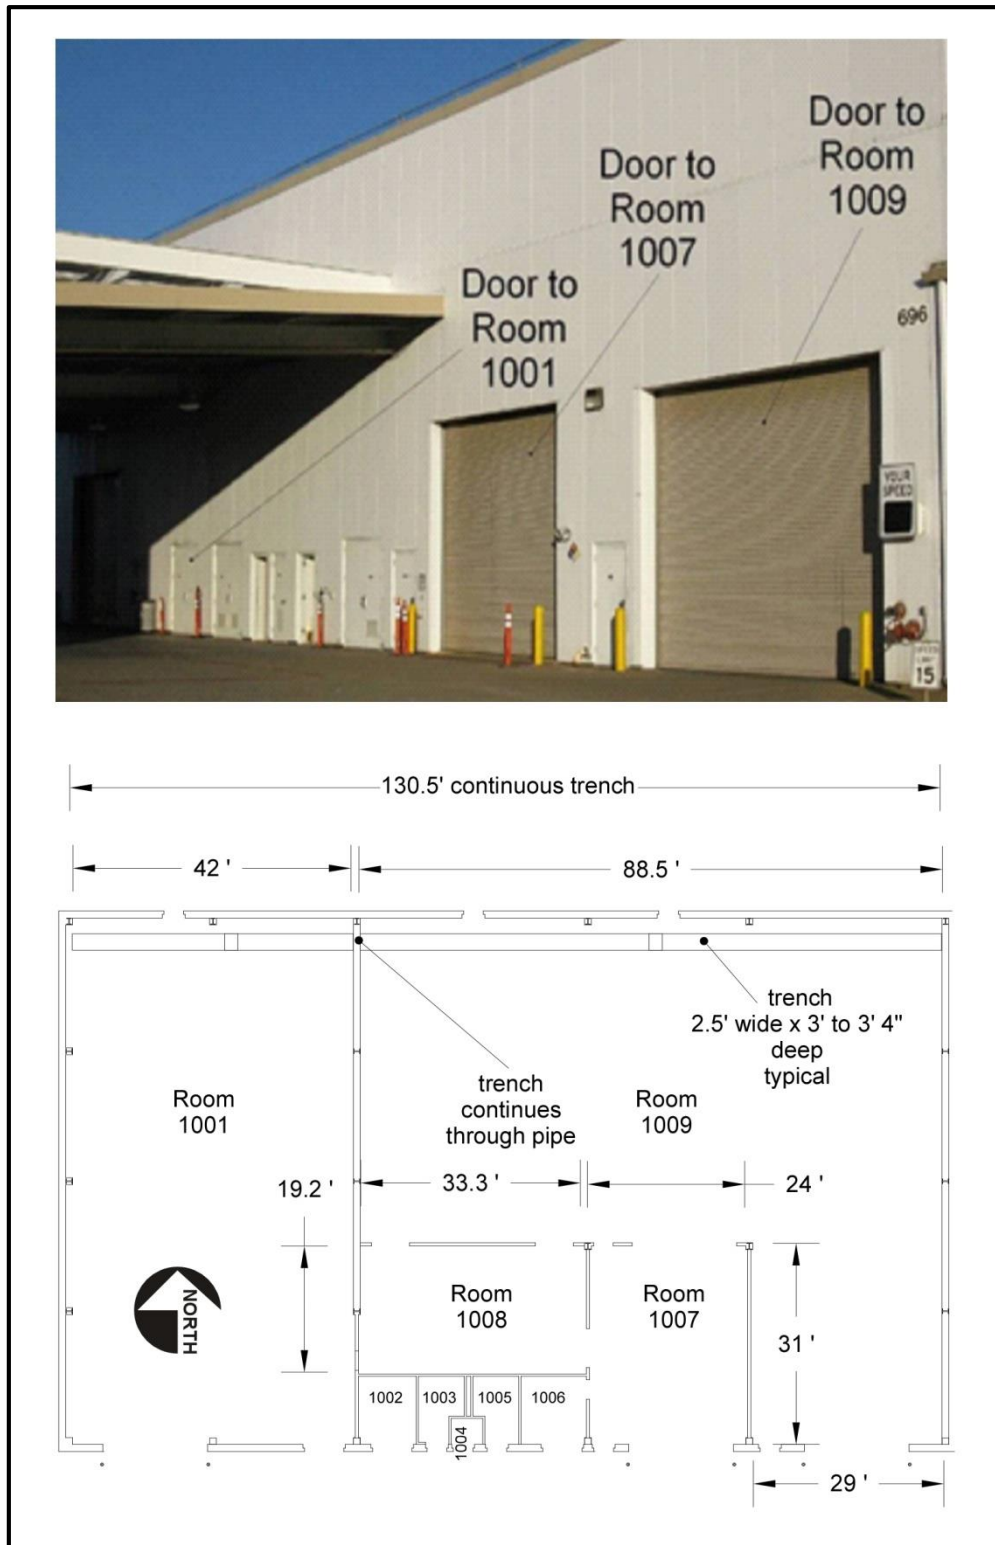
Building 696 Rooms 1001, 1007-1009 Storage Unit
